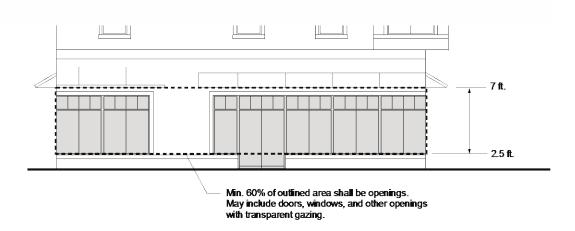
C.4.A: BUILDING TRANSPARENCY
